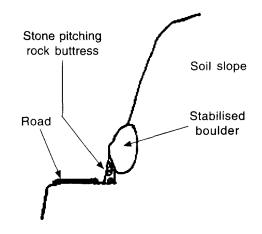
Stone Pitching Rock Buttress was Constructed under the Boulder at Location 5
